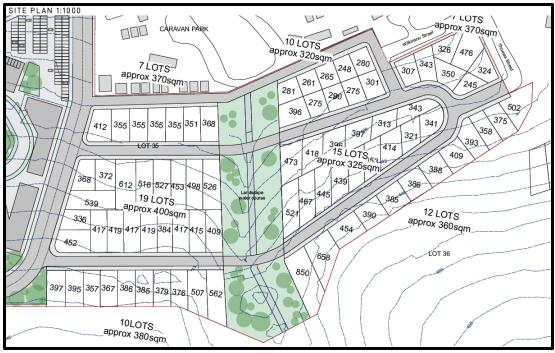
Low Density Residential Site Plan (Source: Robert Harwood Architects)
